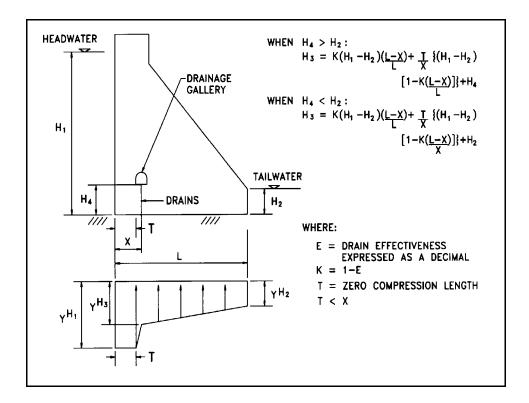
Uplift distribution for cracked base with drainage, zero compression zone not extending beyond drains
